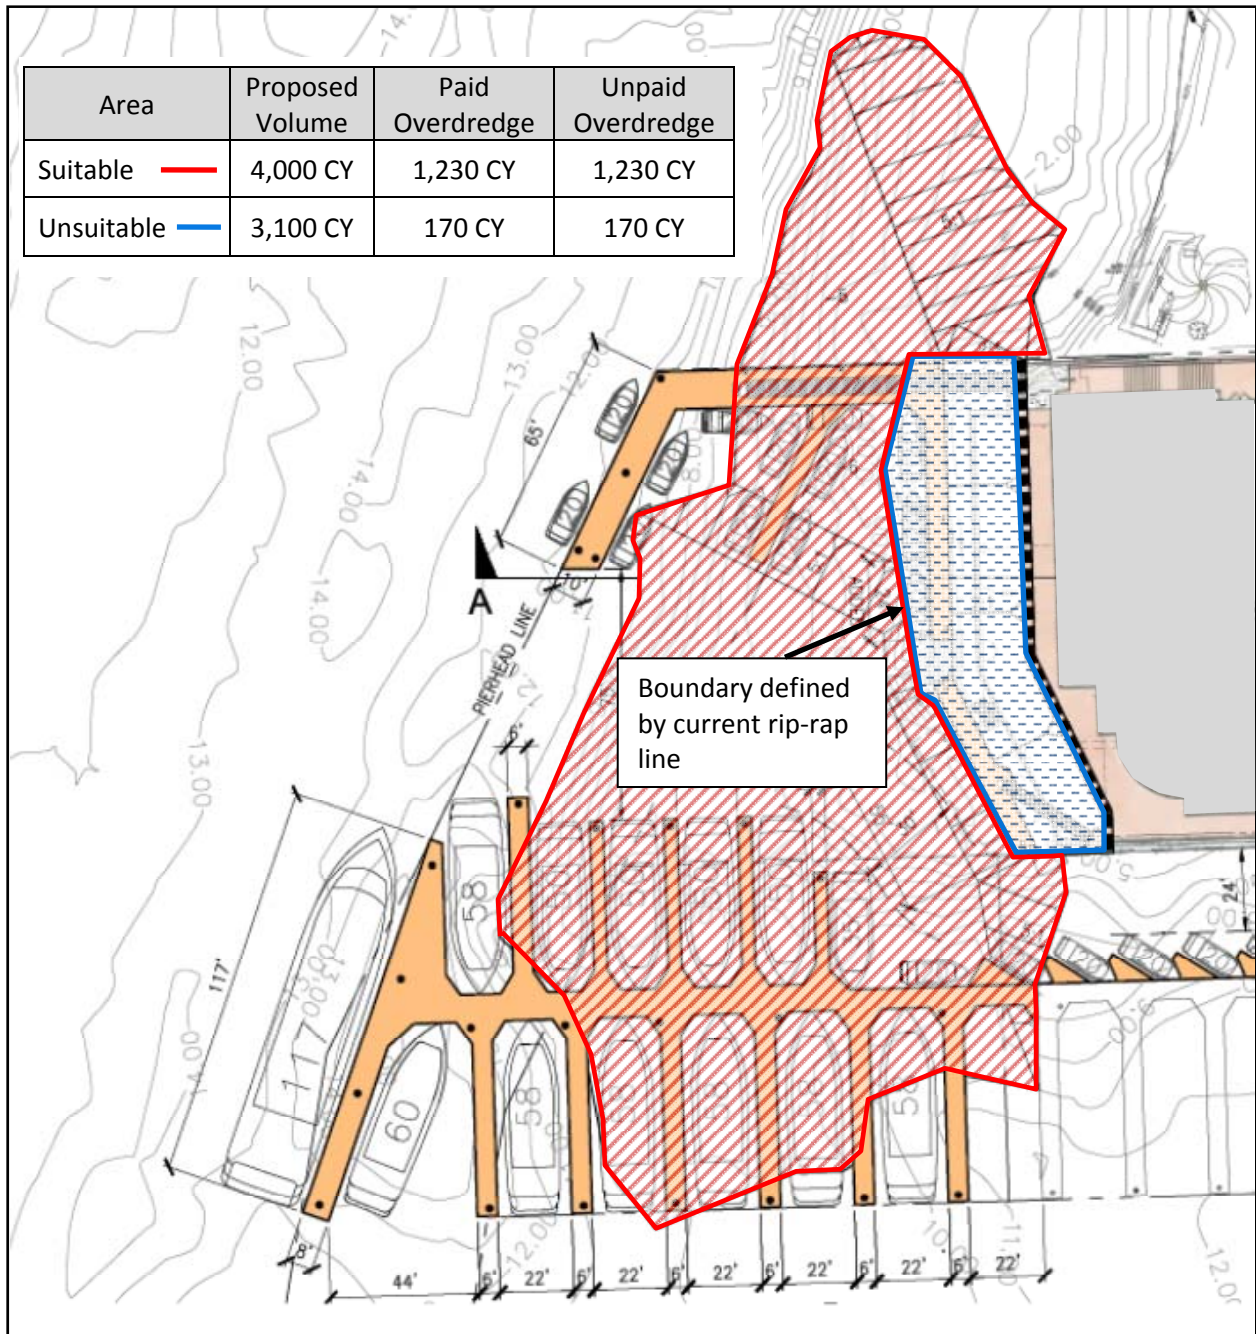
Project plan, proposed dredging footprint and current bathymetry of site.
